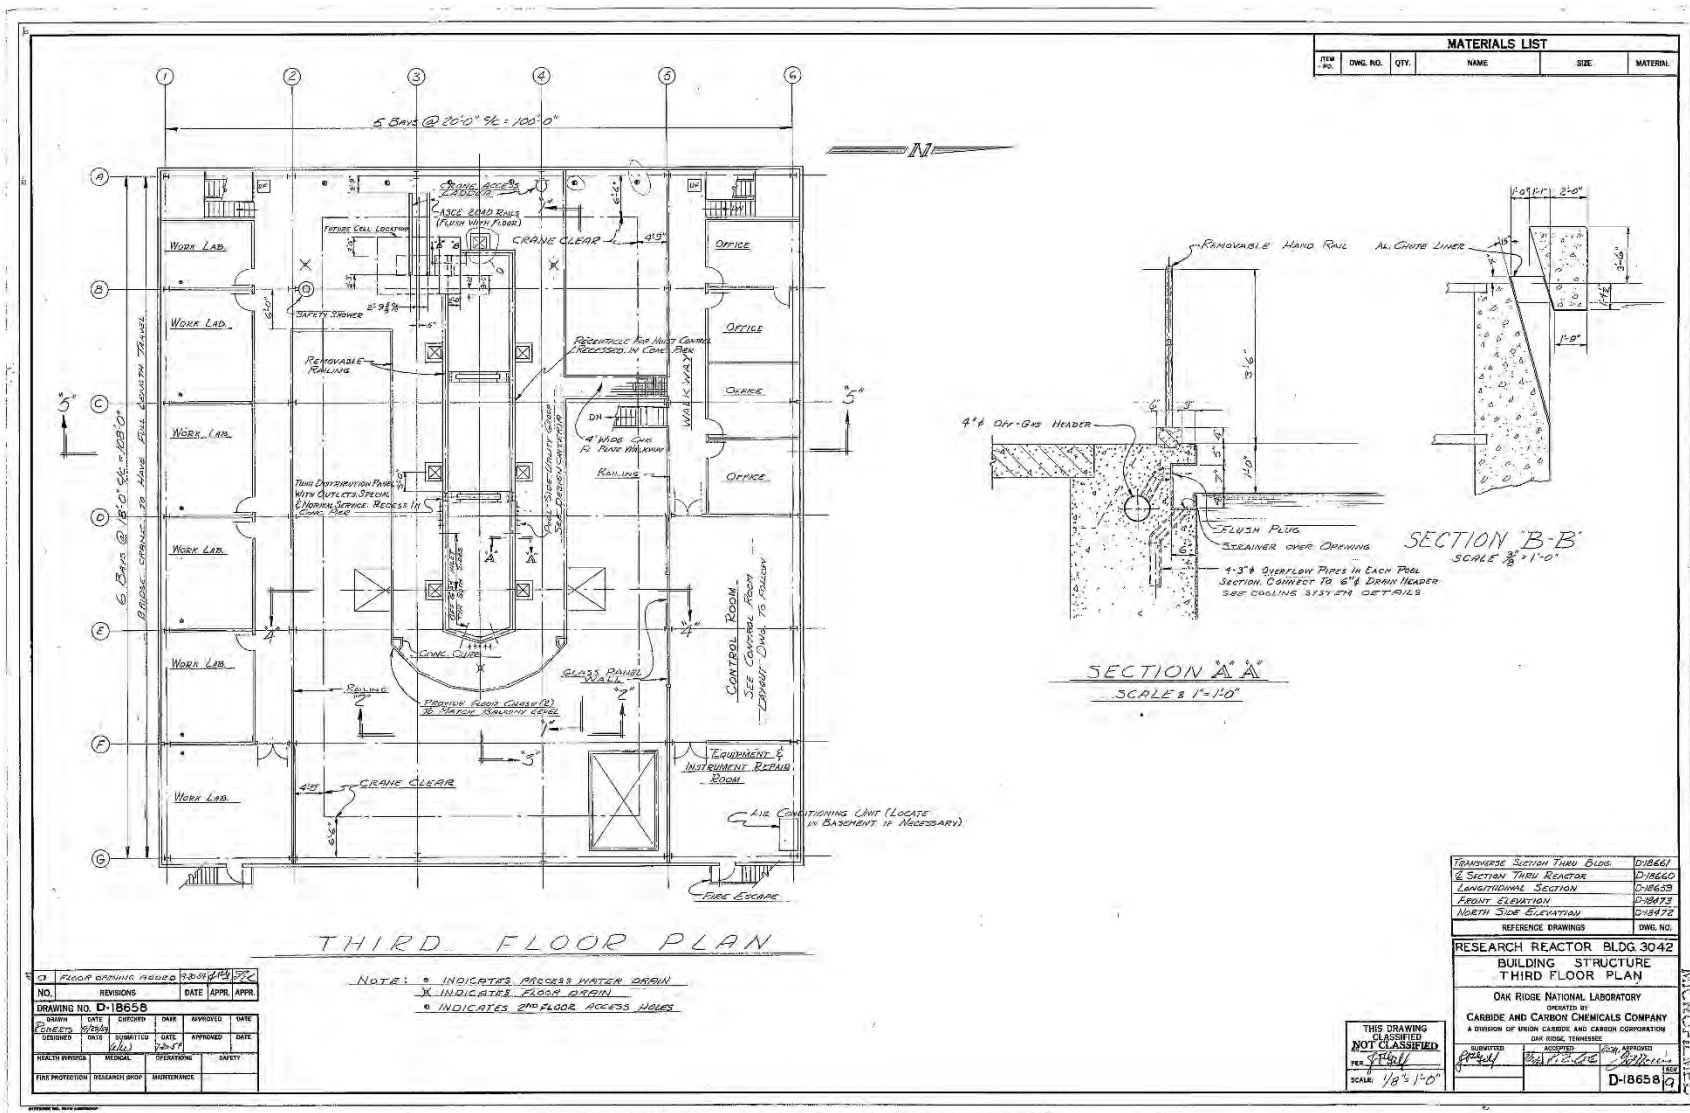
Third floor plan for Building 3042 (Oak Ridge National Laboratory, April 28, 1954).
